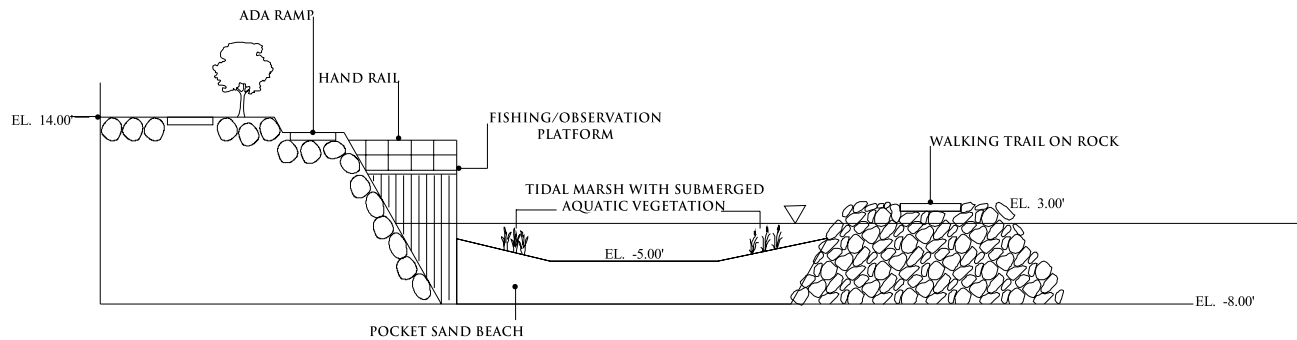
Broadwater marina restoration plan cross-section A-A' (Source: Baker, 1999a)
